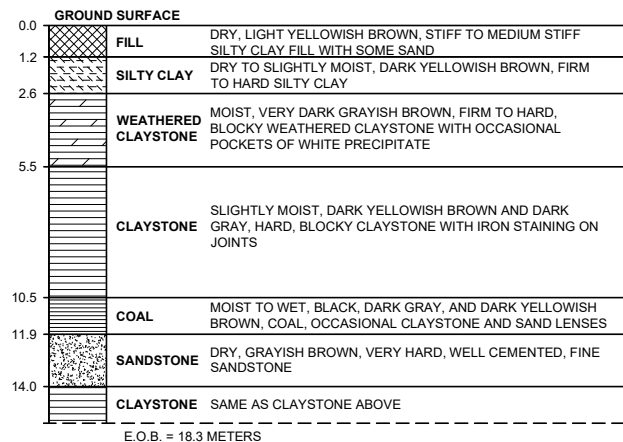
Typical Soil Profile and Primary Subsurface Units at the TRACON Facility
